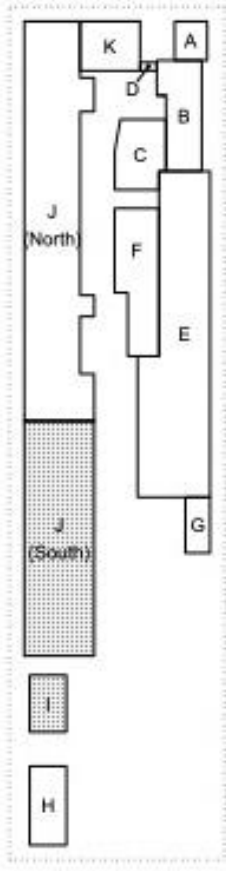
Floor Plans, Wood Shop, South Machine Shop
